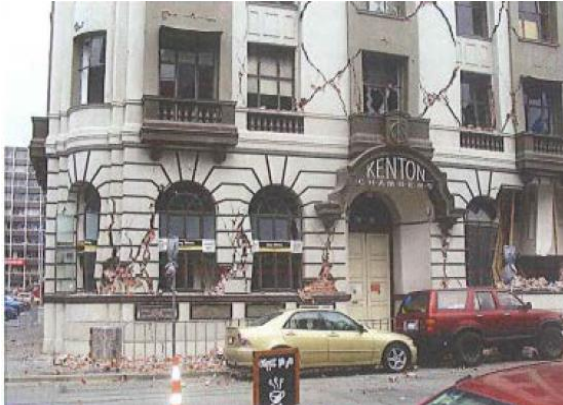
X-shaped cracking in slender URM piers [21]
